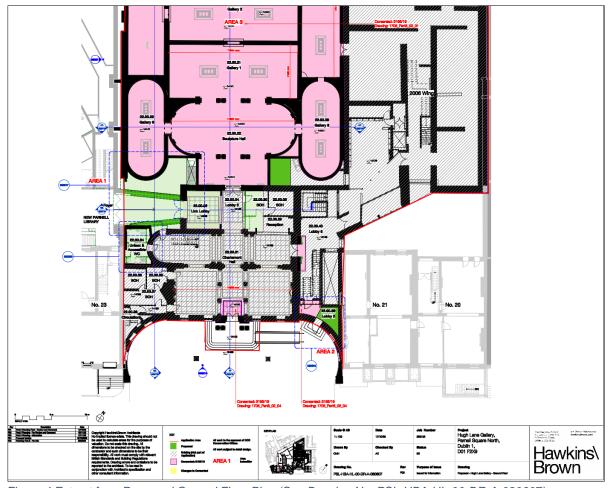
Extract from Proposed Ground Floor Plan (See Drawing No. PSL-HBA-HL-00-DR-A-080607)
